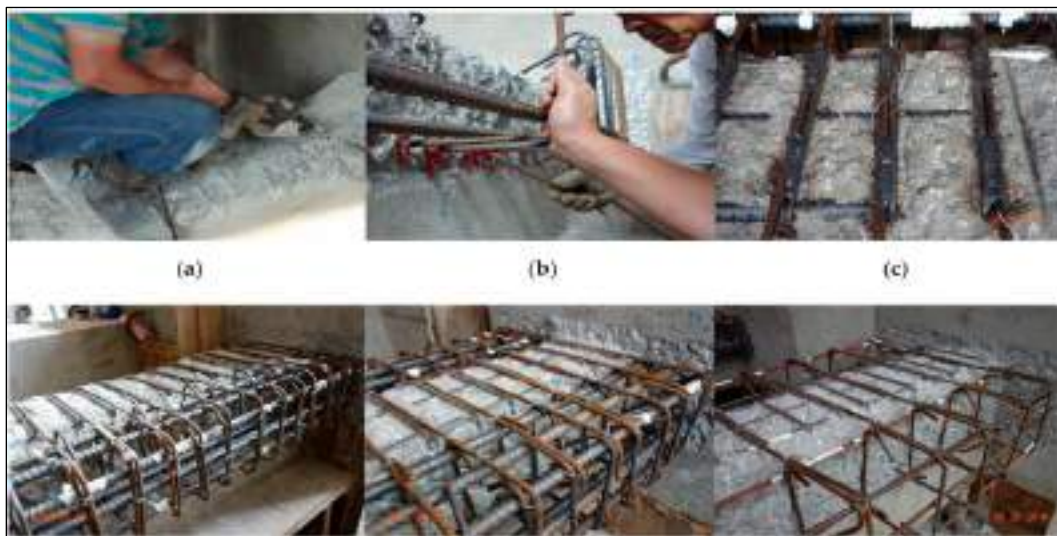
Details of Reinforced Concrete Jacketing Technique.[9]
